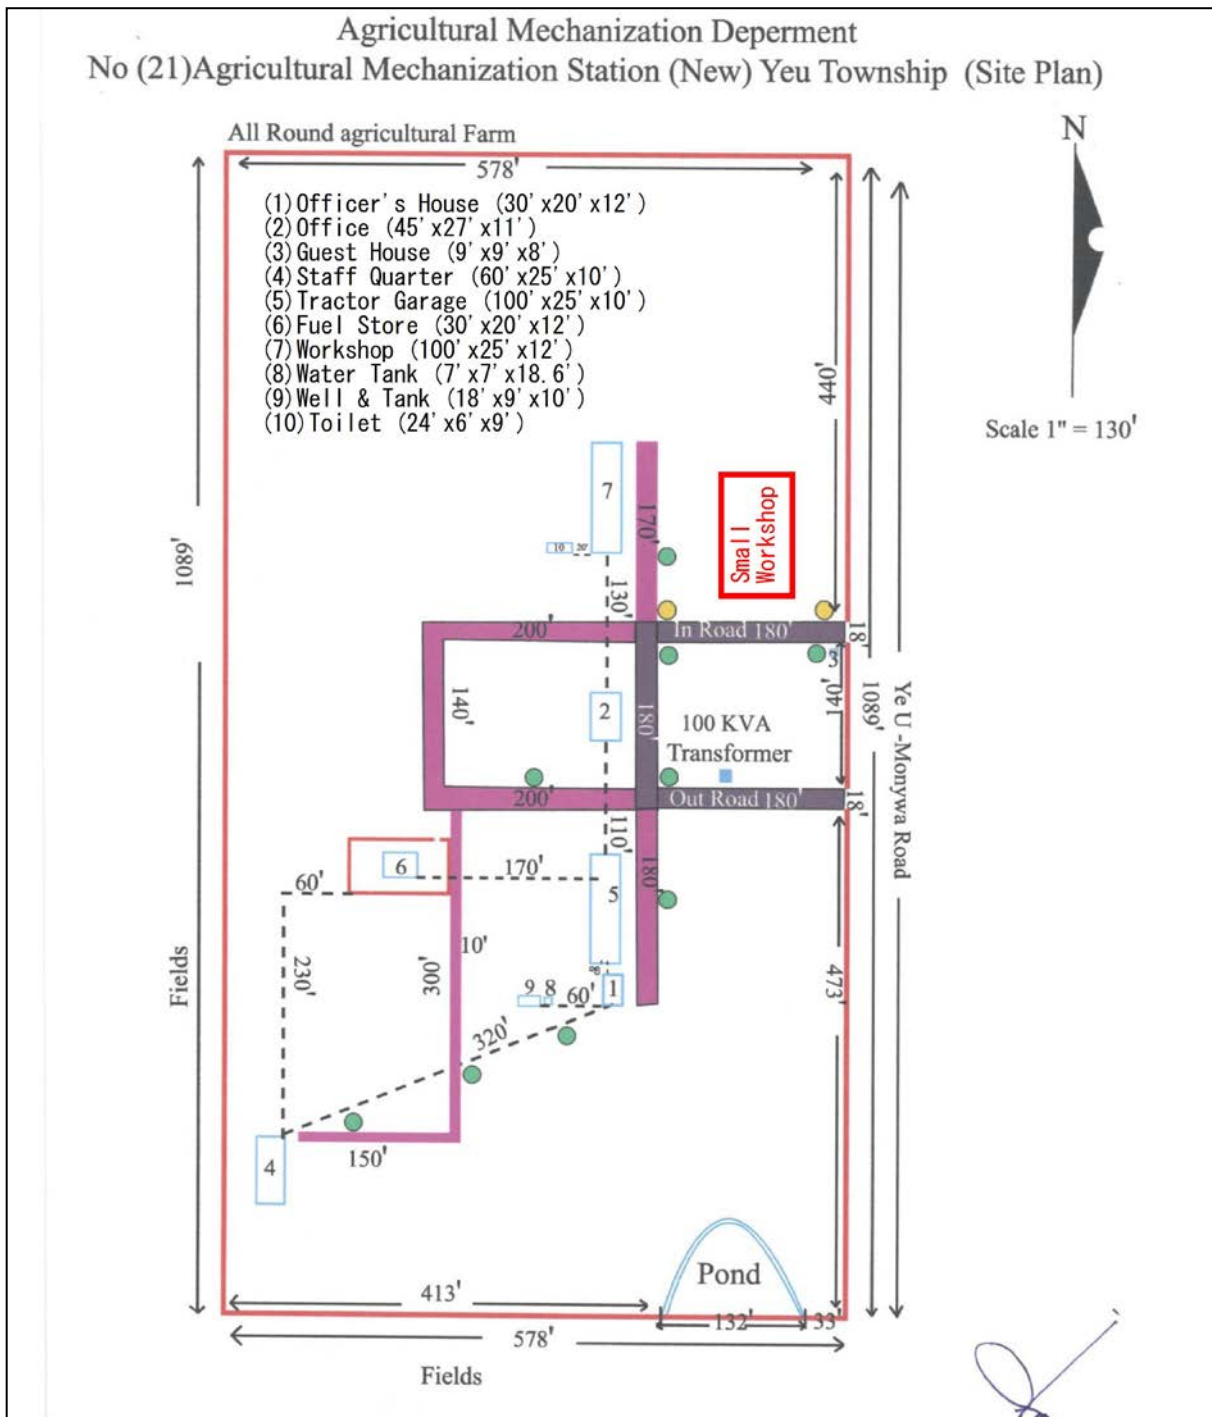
Site Plan of Small Workshop at AMS No.21 (Ye-U)
